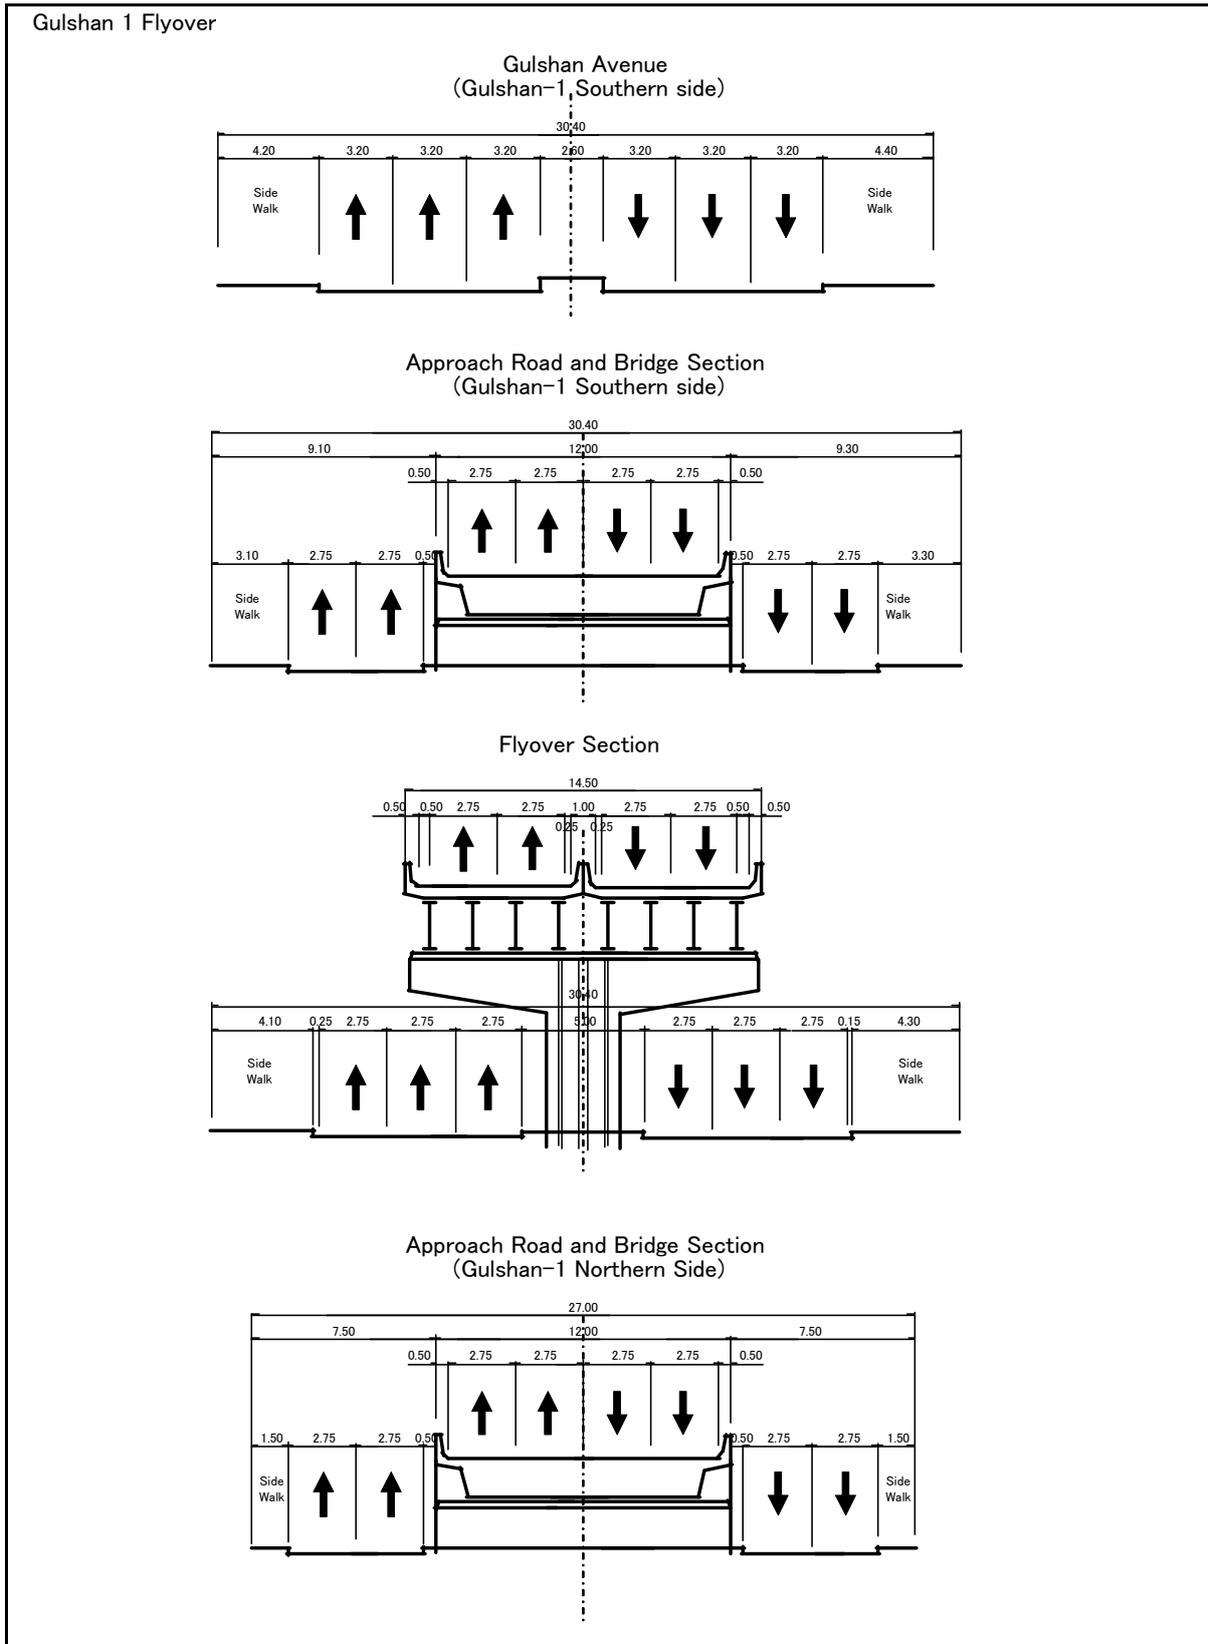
Typical Cross Section of Gulshan-1 Flyover Plan
